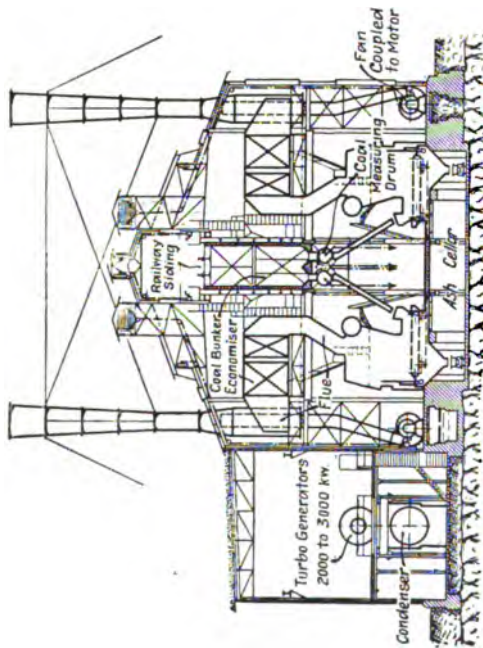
Brakpan Power Station. Section through Engine Room and Boiler House. Scale, 1 to 500.
